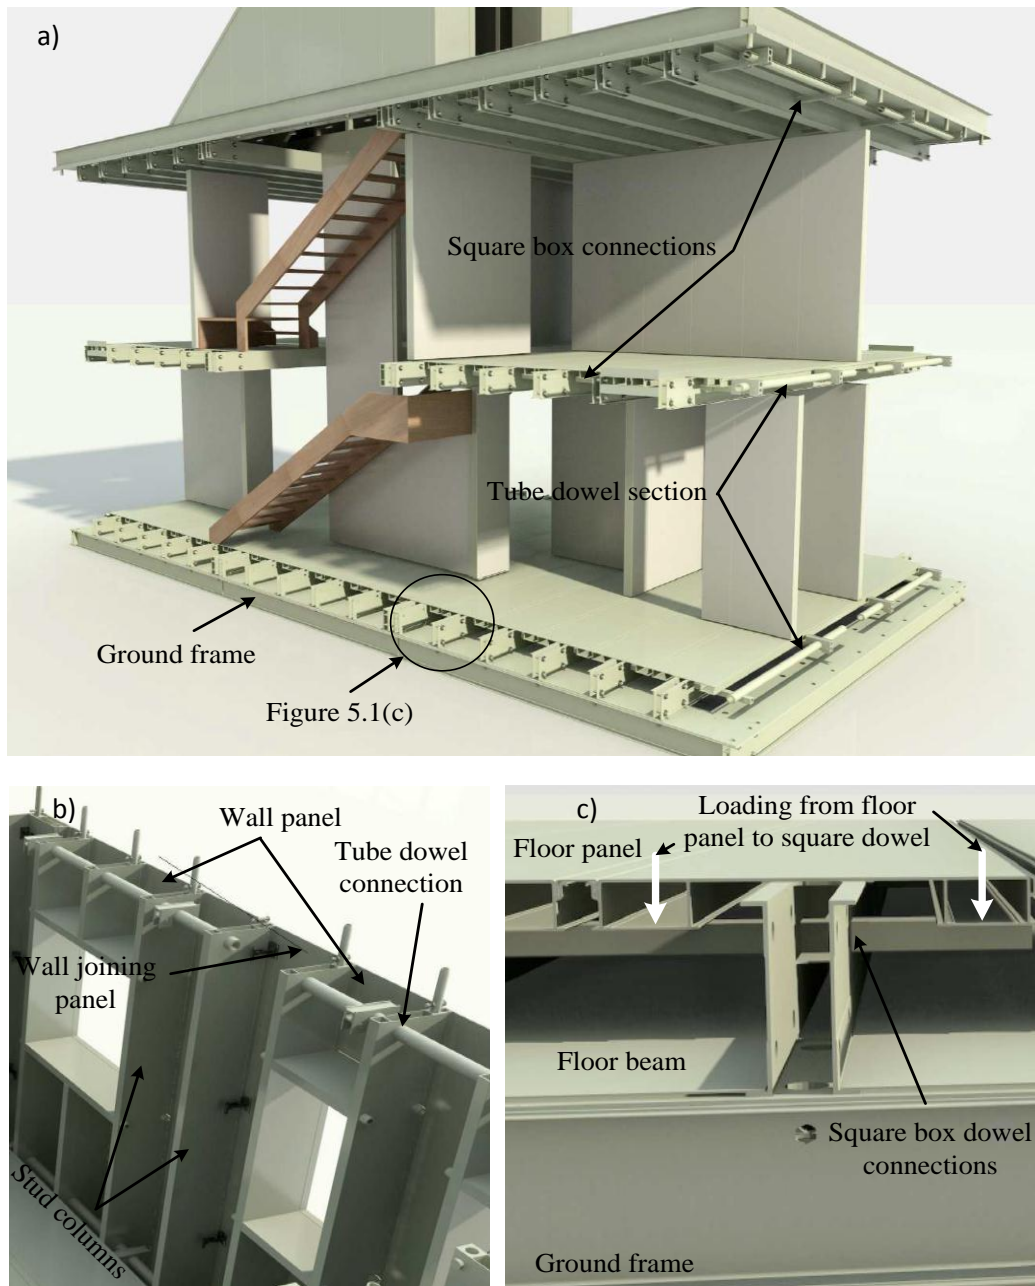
Startlink house assemblies; a) A stage of house with internal walls and hollow dowel shapes of square box and tube sections; b) Wall panel showing tube dowel connections; c) Floor panel showing square box dowel connections.
